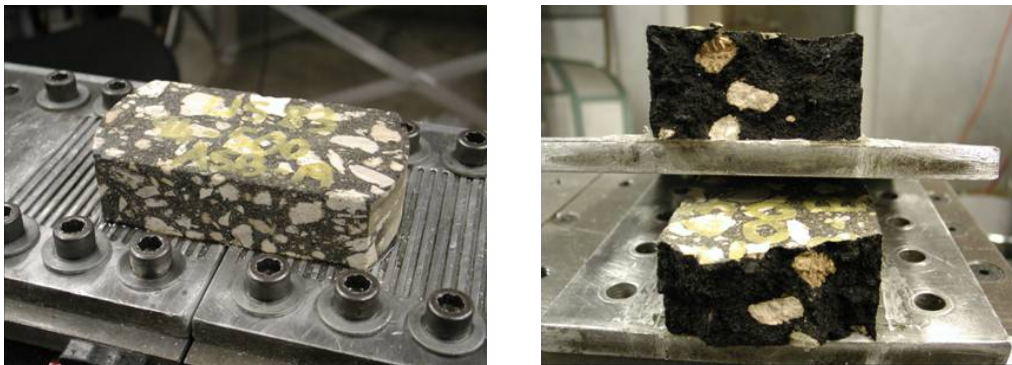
US 83 Stabilized Base Specimens Cracked in the Overlay Tester.
